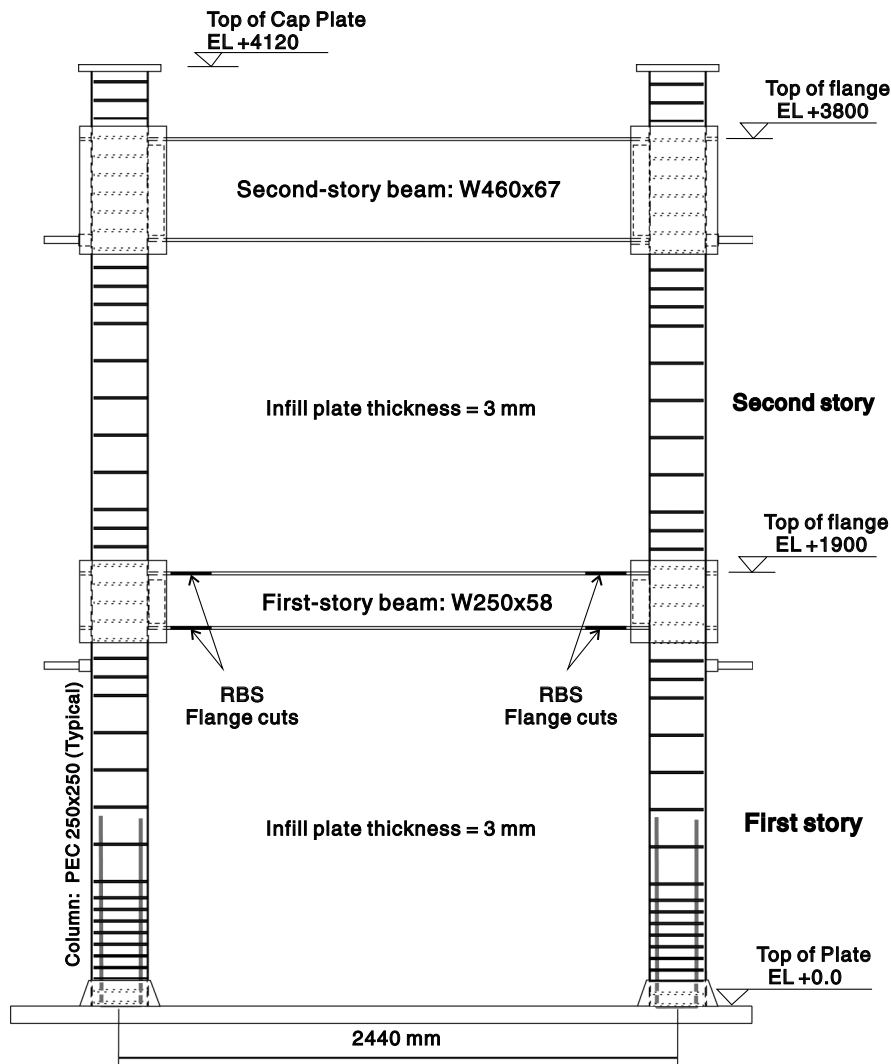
Elevation view of the RBS steel plate shear wall test specimen
